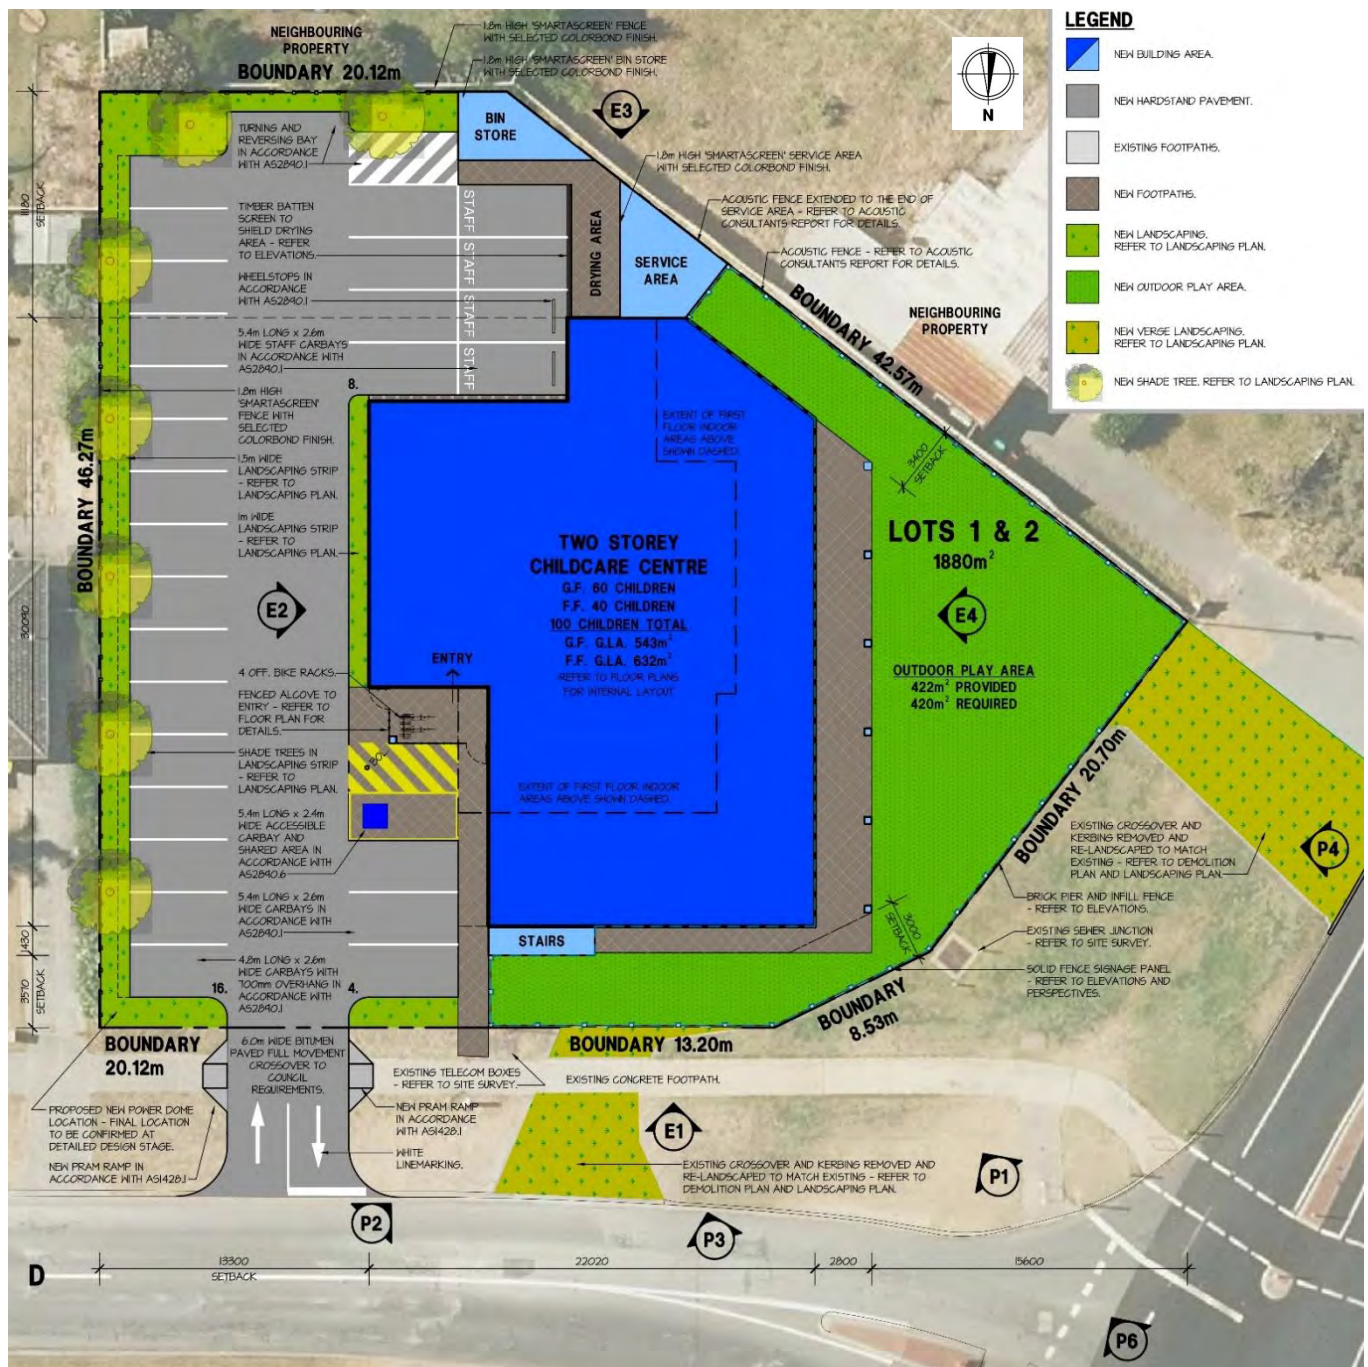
Site plan for the proposed Shoalwater Childcare Centre (source: Hindley and Associates Building Designers, 2022)
